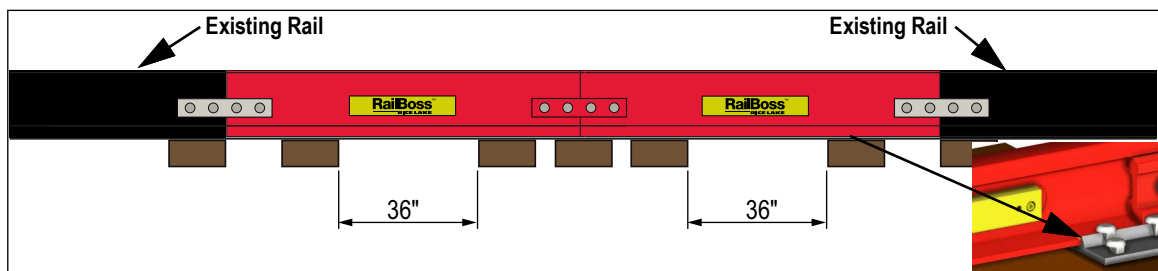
Tie Spacing in Relation to Existing Rail and Installed RailBoss
